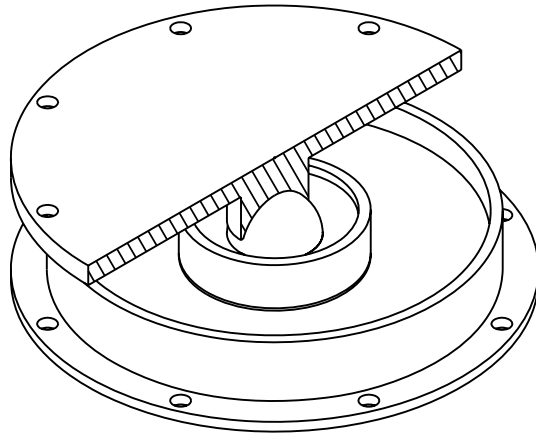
Cutaway View of the Modified Single FP Bearing
